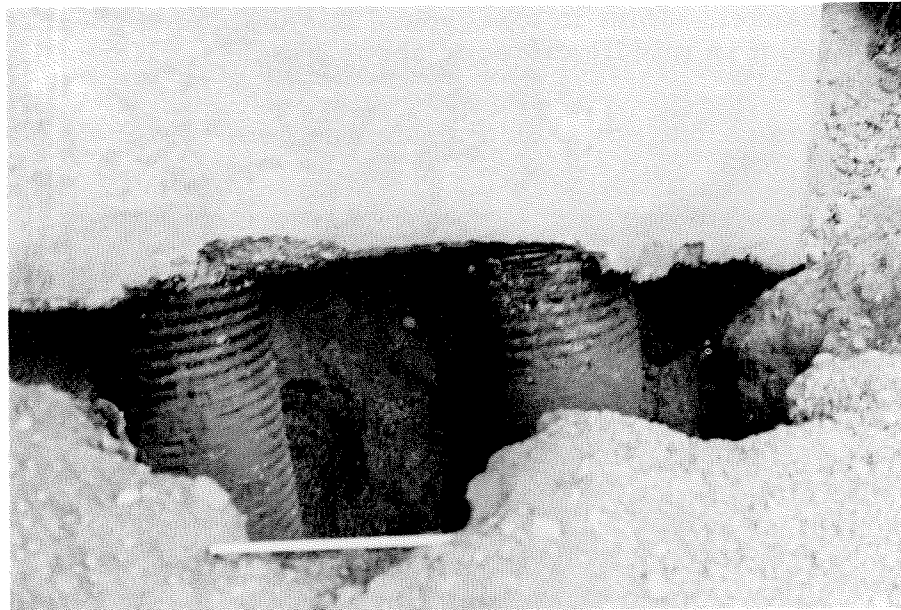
Lateral movement of Roxford Street bridge on abutments has failed tops of piles. (Foothill freeway).
